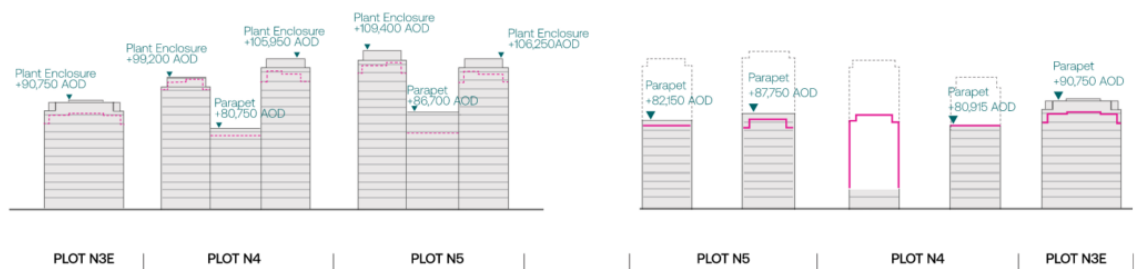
Detailed element north and south elevations showing approved heights in pink
